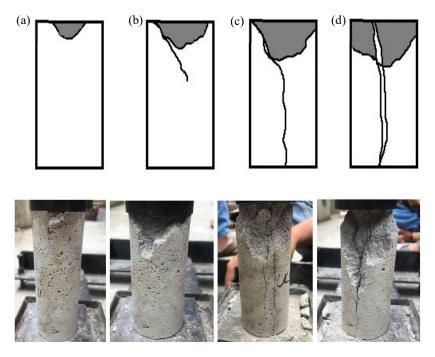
Illustration and photograph of fracturing process: a) cratering, b) initial fracture formation, c) fracture development, d) total failure.
